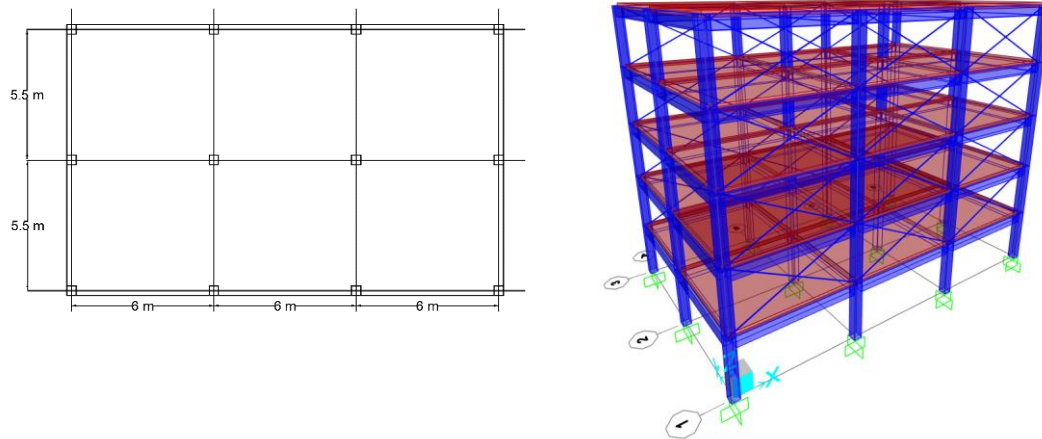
Floor plan (left) SAP2000 model of building with pilotis (right)
